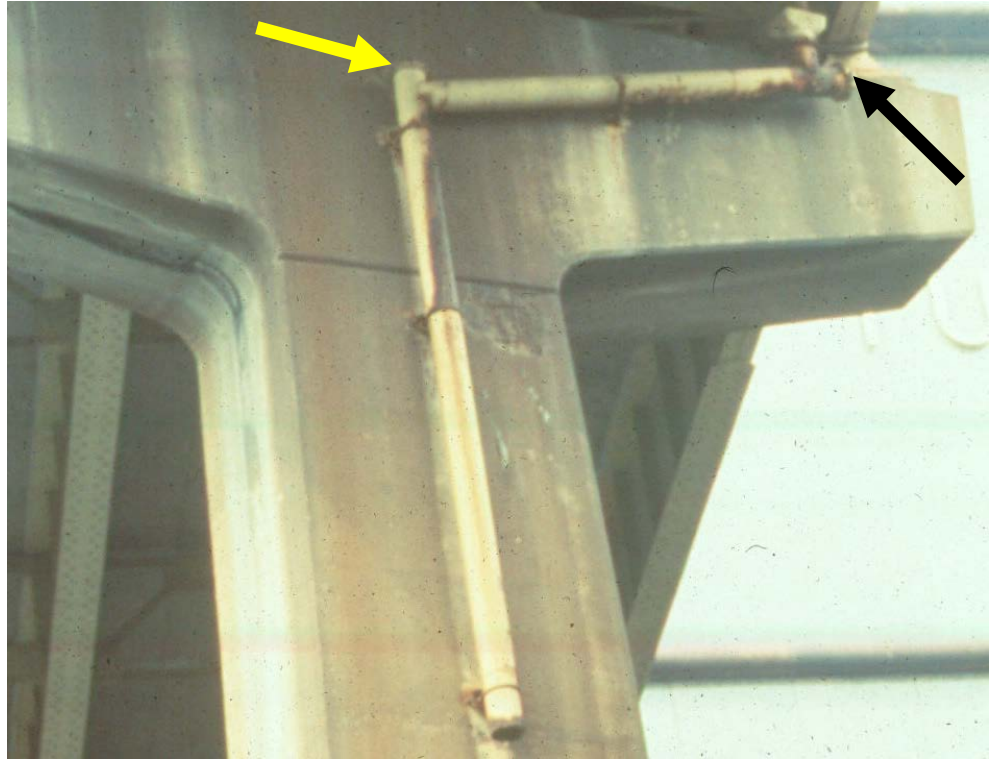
Outlet Pipe with Cleanout Plugs
